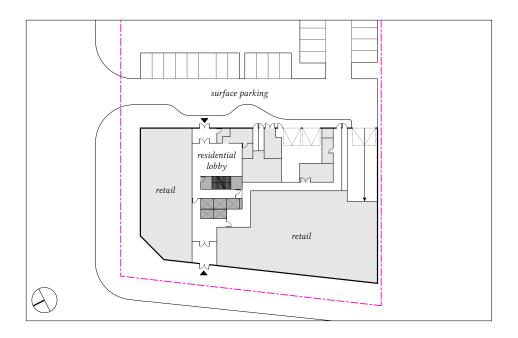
Condominium Project Podium Plan: Ground, Retail Floor—this figure illustrates the schematic layout of the condominium project's ground floor, as developed prior to the global pandemic. The plan features retail space, residential access, services spaces, and access to the underground parking. (source: figure by author; adapted from a project by Kirkor Architects and Planners, n.d.)
